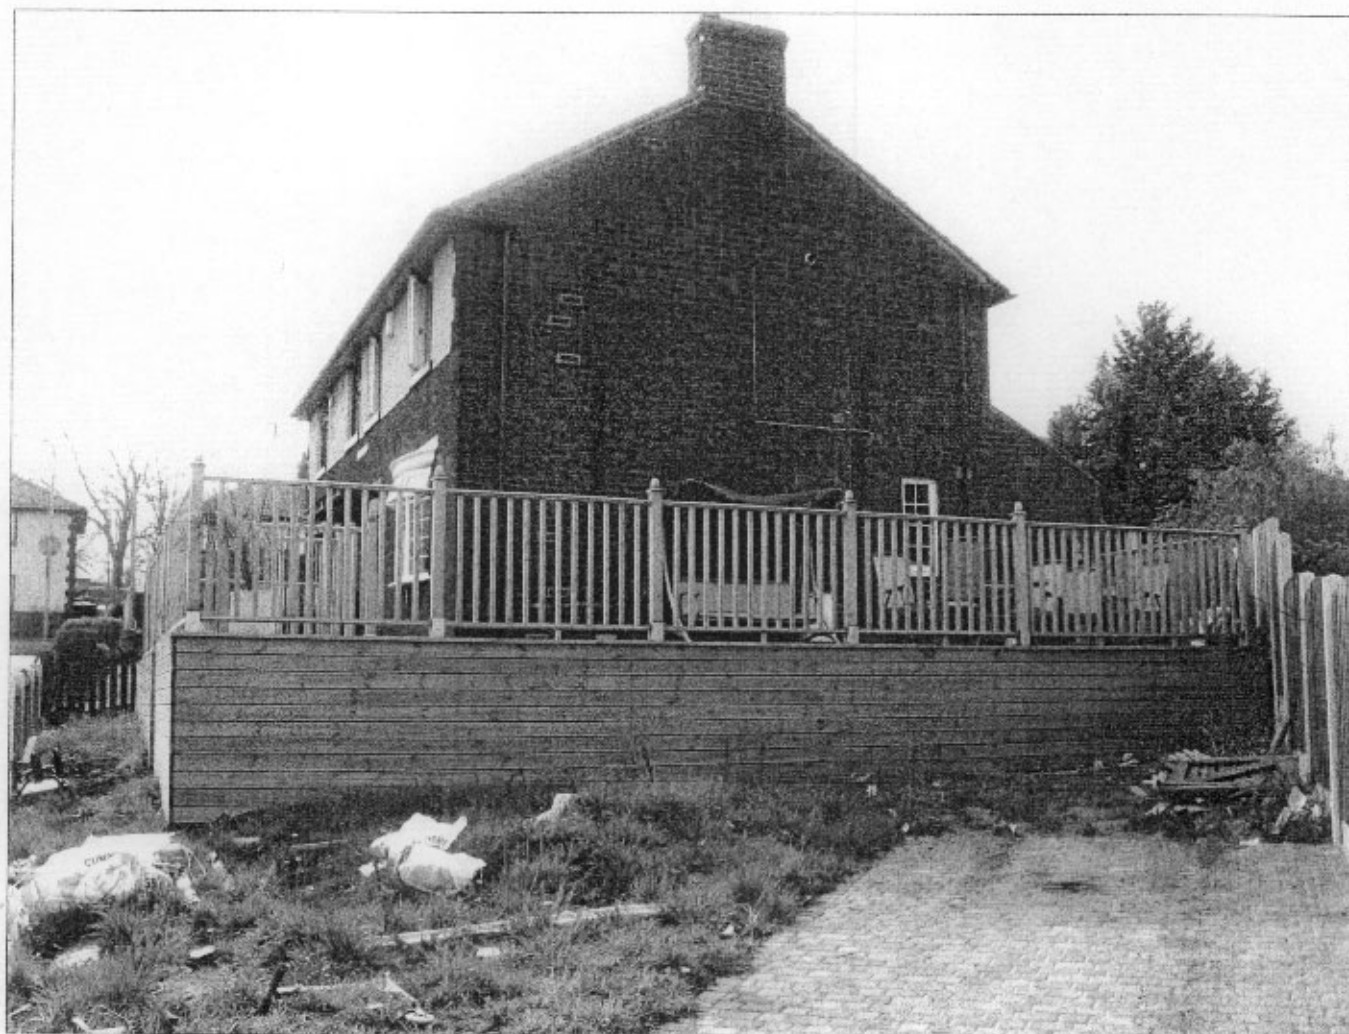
Photograph of the decking taken from Dowbeck Road – the impact of the decking could be reduced by some appropriate landscaping.
